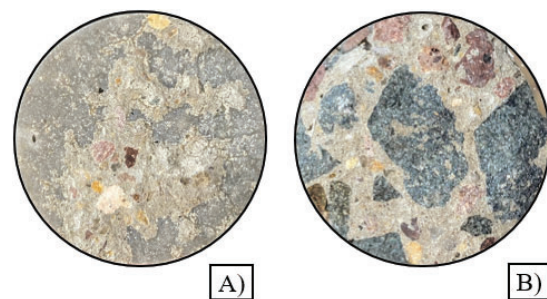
Typical failure surfaces in tensile adhesion tests: A) adhesion/near surface mixed failure with formwork-smooth concrete surface, B) concrete failure in specimen with exposed aggregate concrete surface
